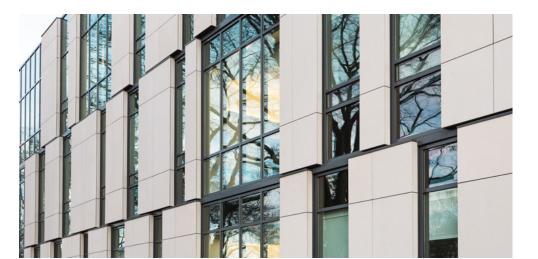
ARCHITECTURAL CONCRETE PANELS EXAMPLE
